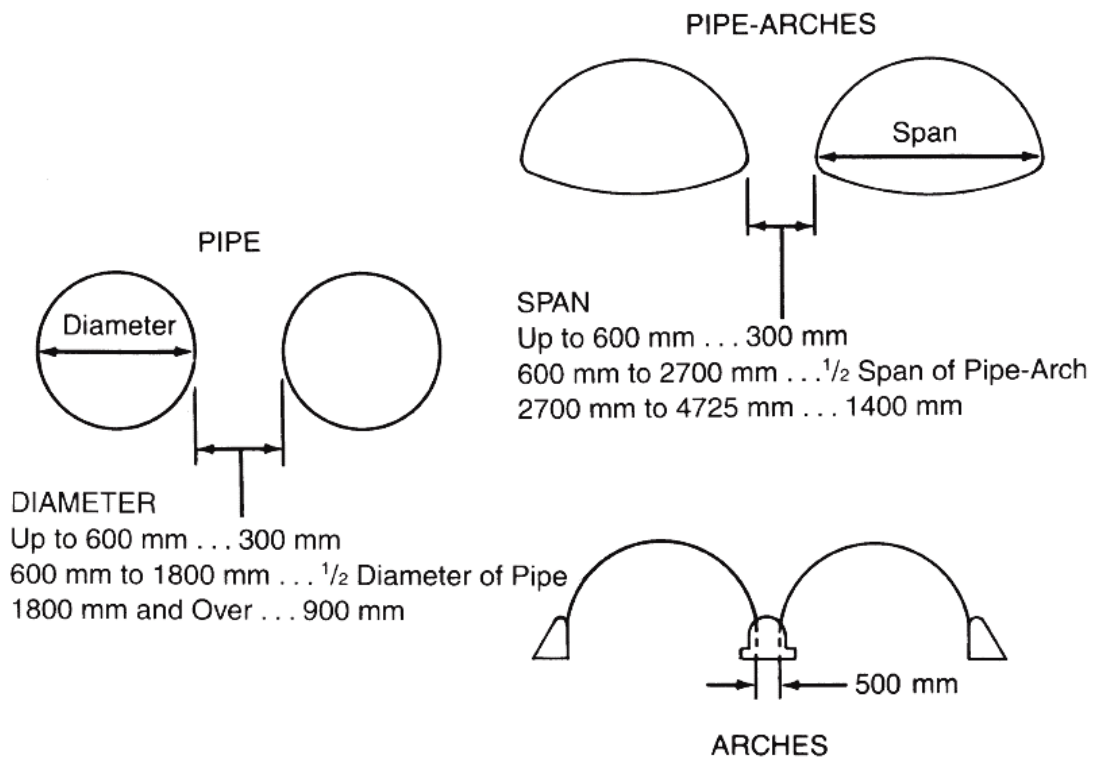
Minimum permissible spacing for multiple installations.^[6]
